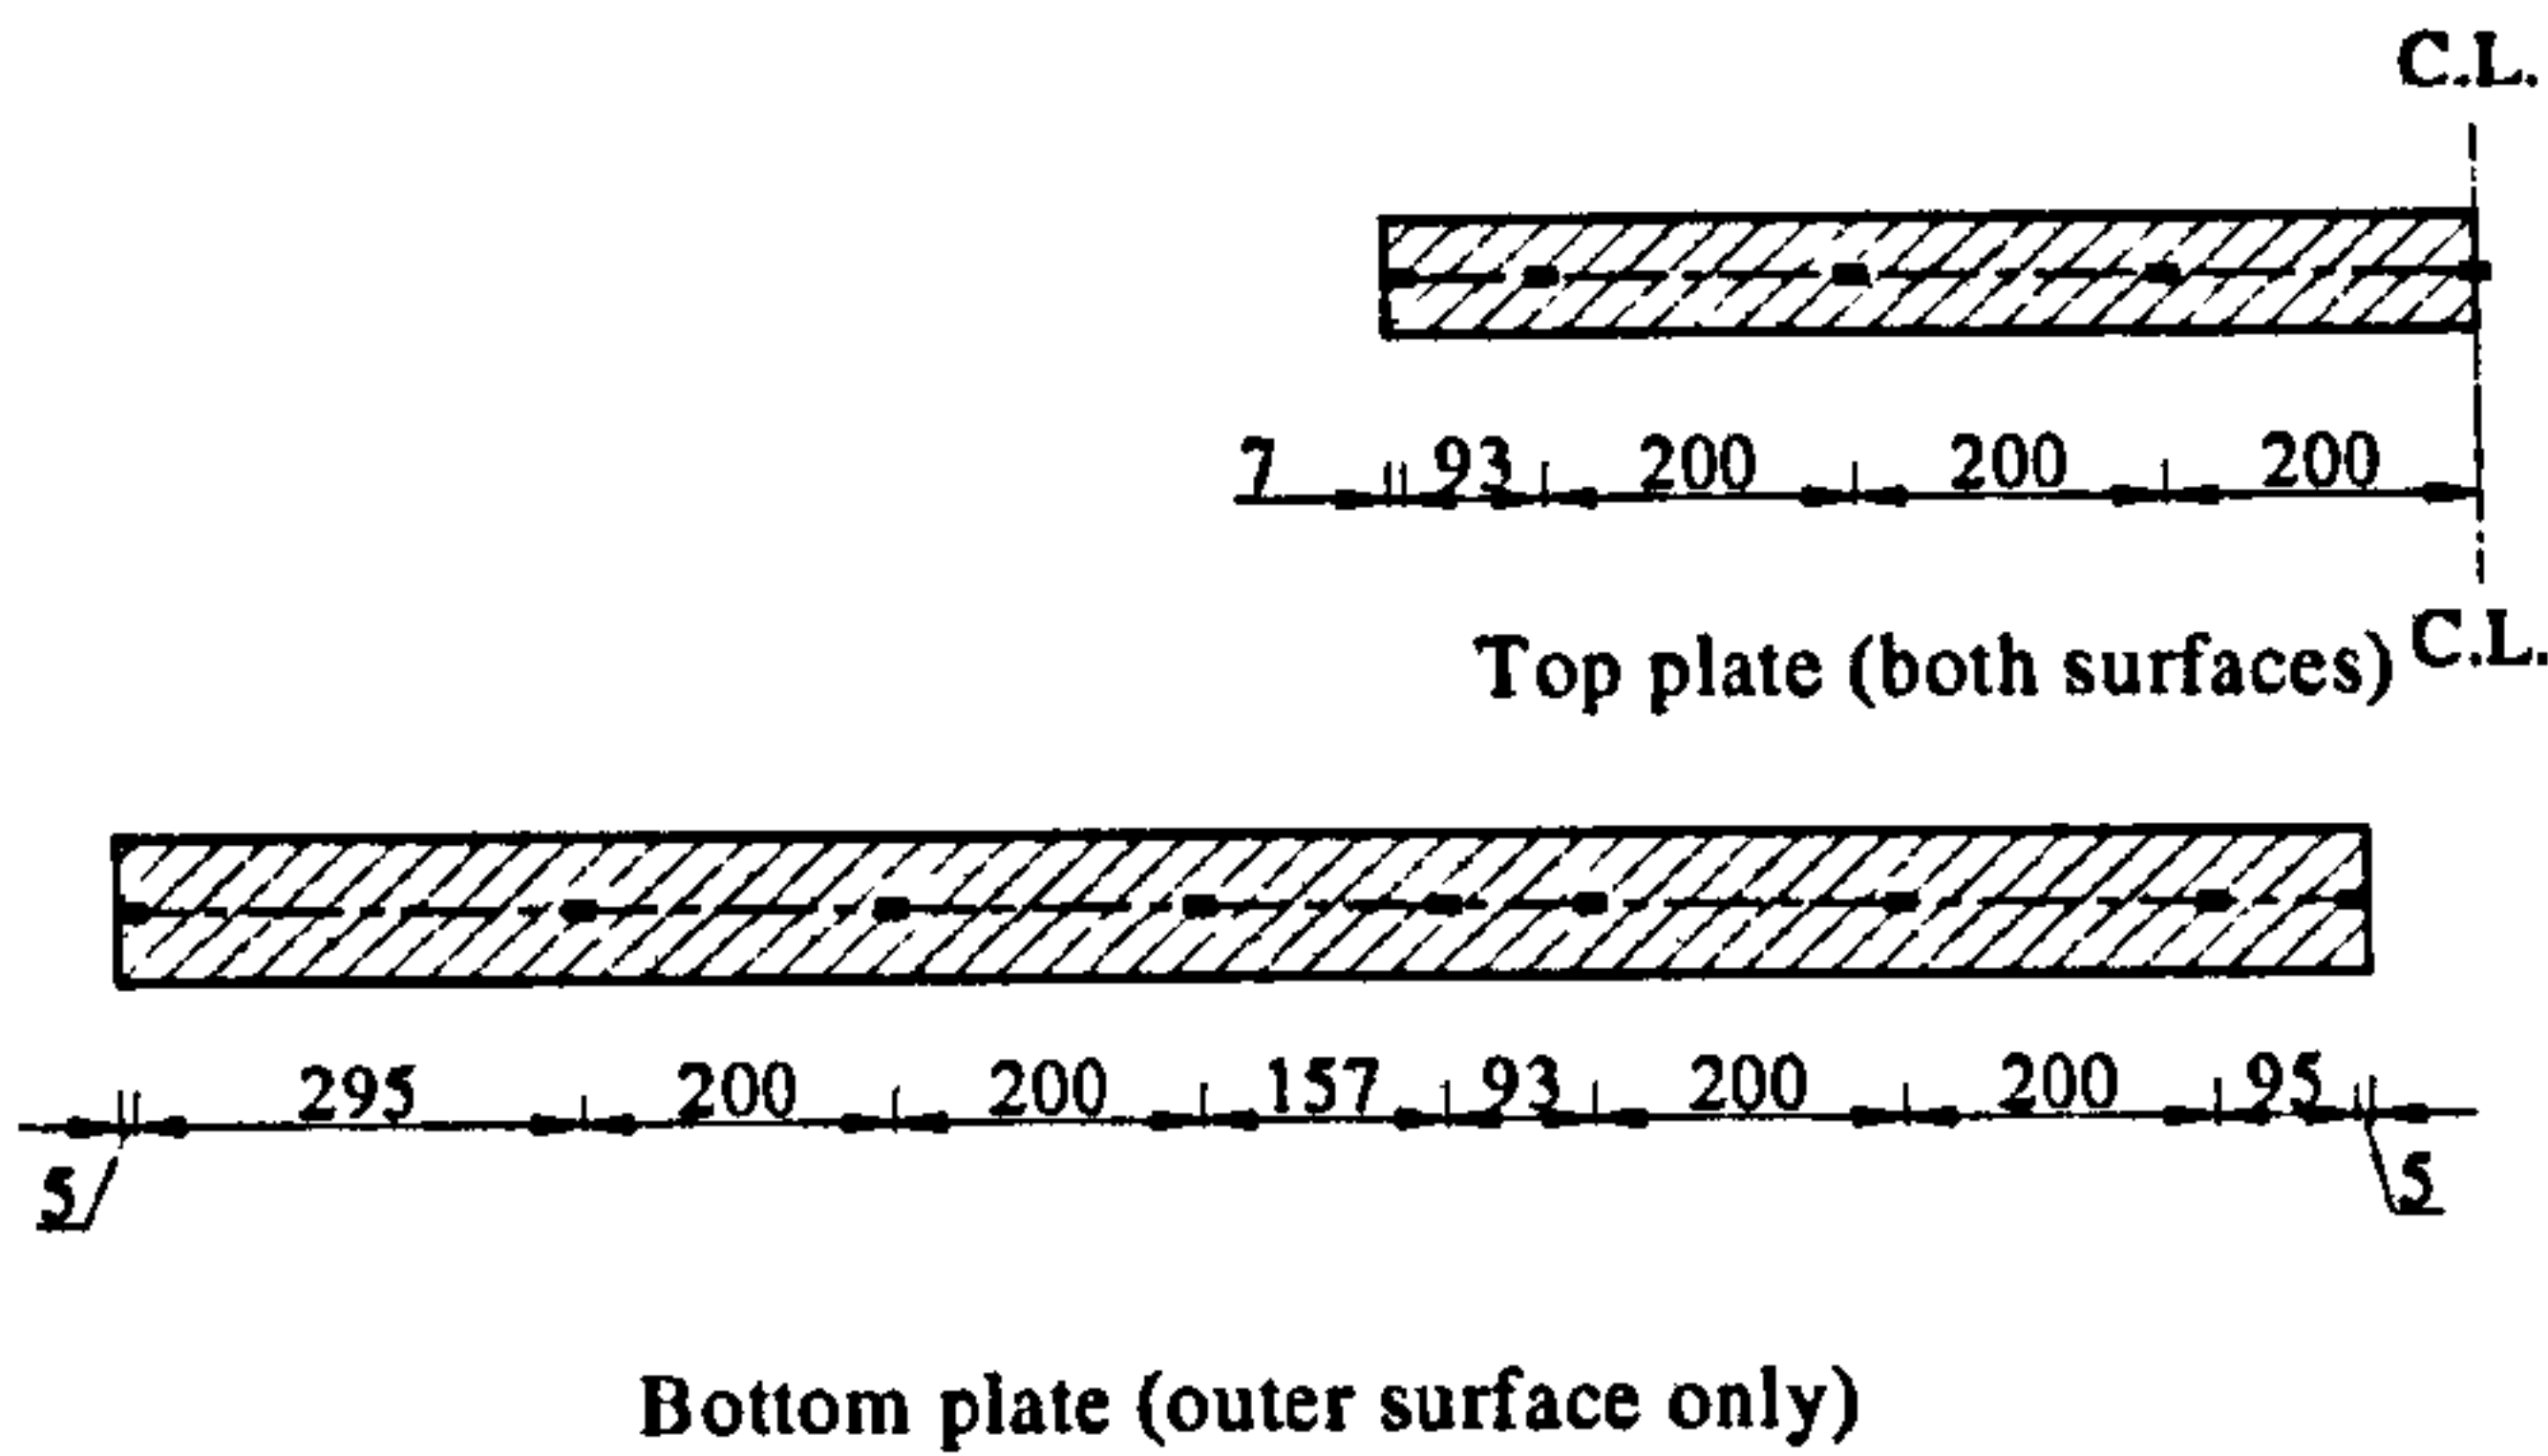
Steel stiffening plates adhesively bonded to the beam
